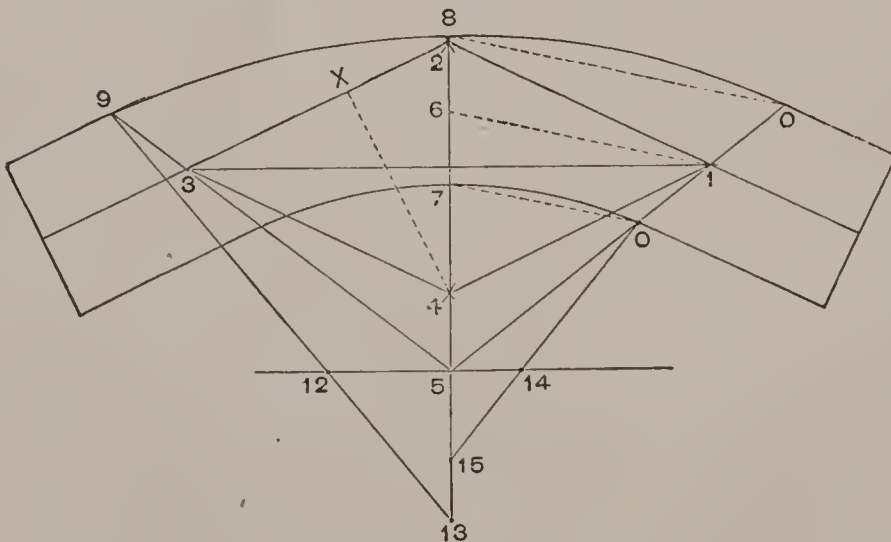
SHOWING MANNER OF DRAWING MOULD.
